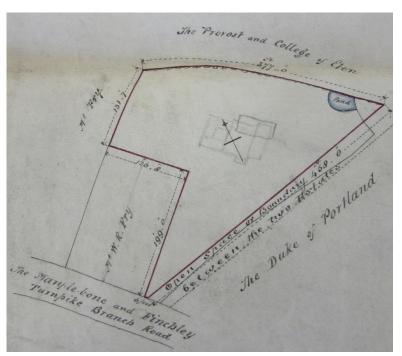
Lease plan showing the footprint and layout of No. 28, enveloping the site of No. 30 (1842).
